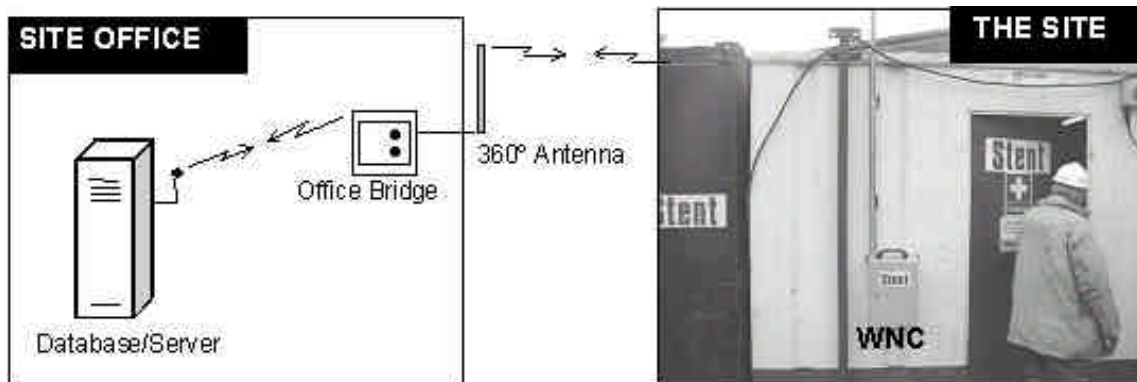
Initial Configuration at Kings Cross with wireless connections at site office and between site
